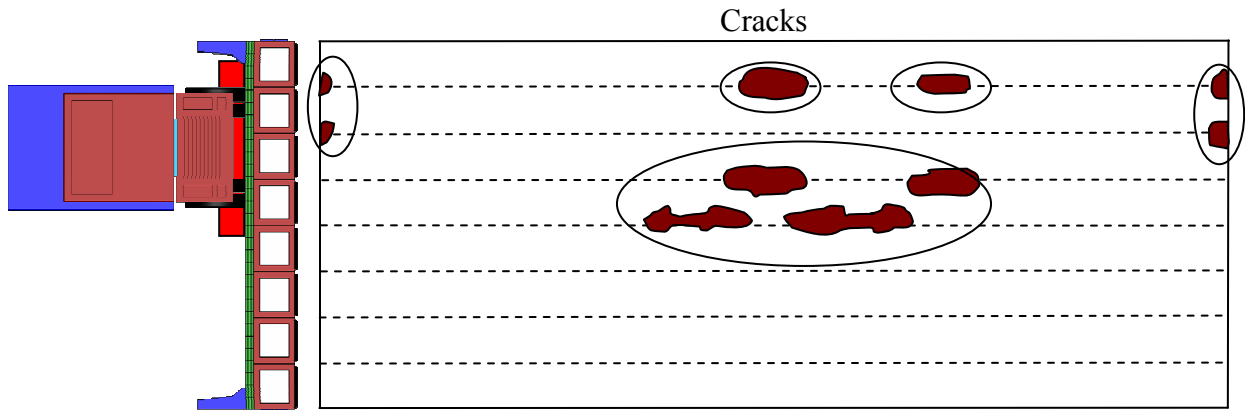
Crack development in the slab bottom surface after applying 120% of AASHTO HL-93 load.
